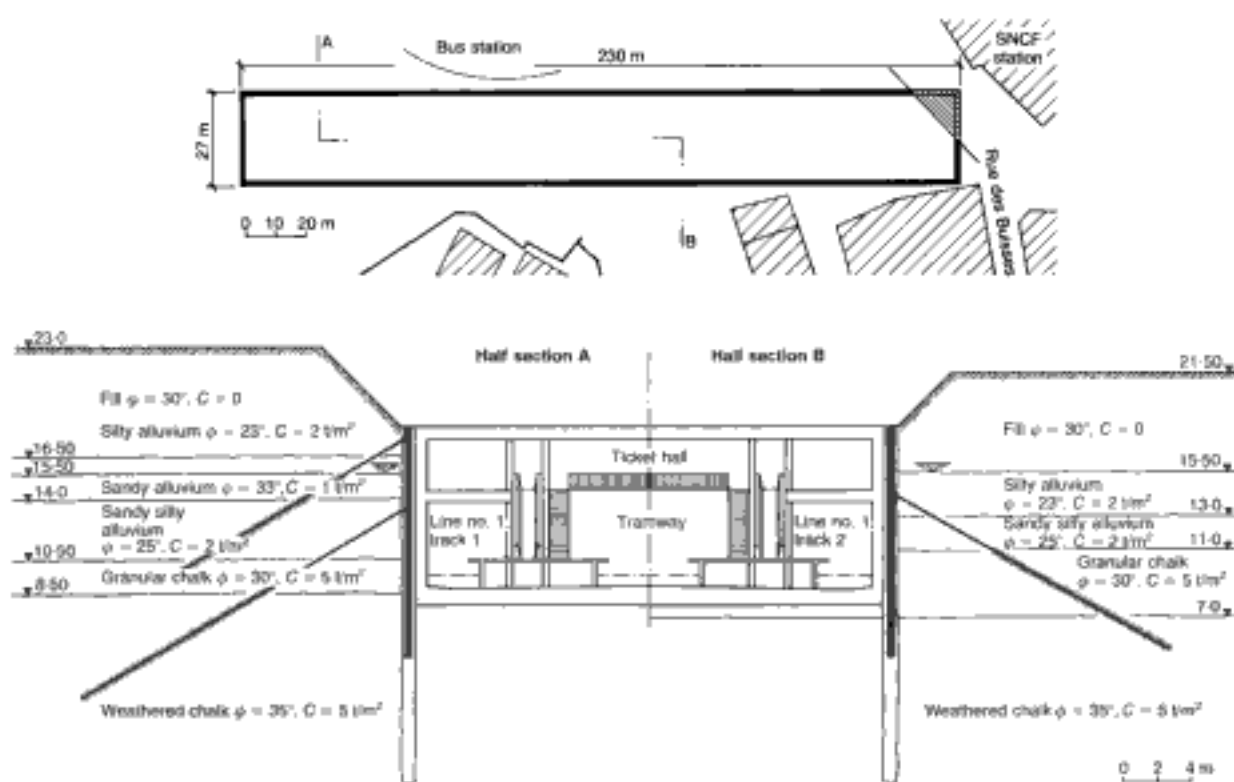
Gare de Lille metro station: (a) plan; (b) transverse sections (courtesy of Soletanche)
